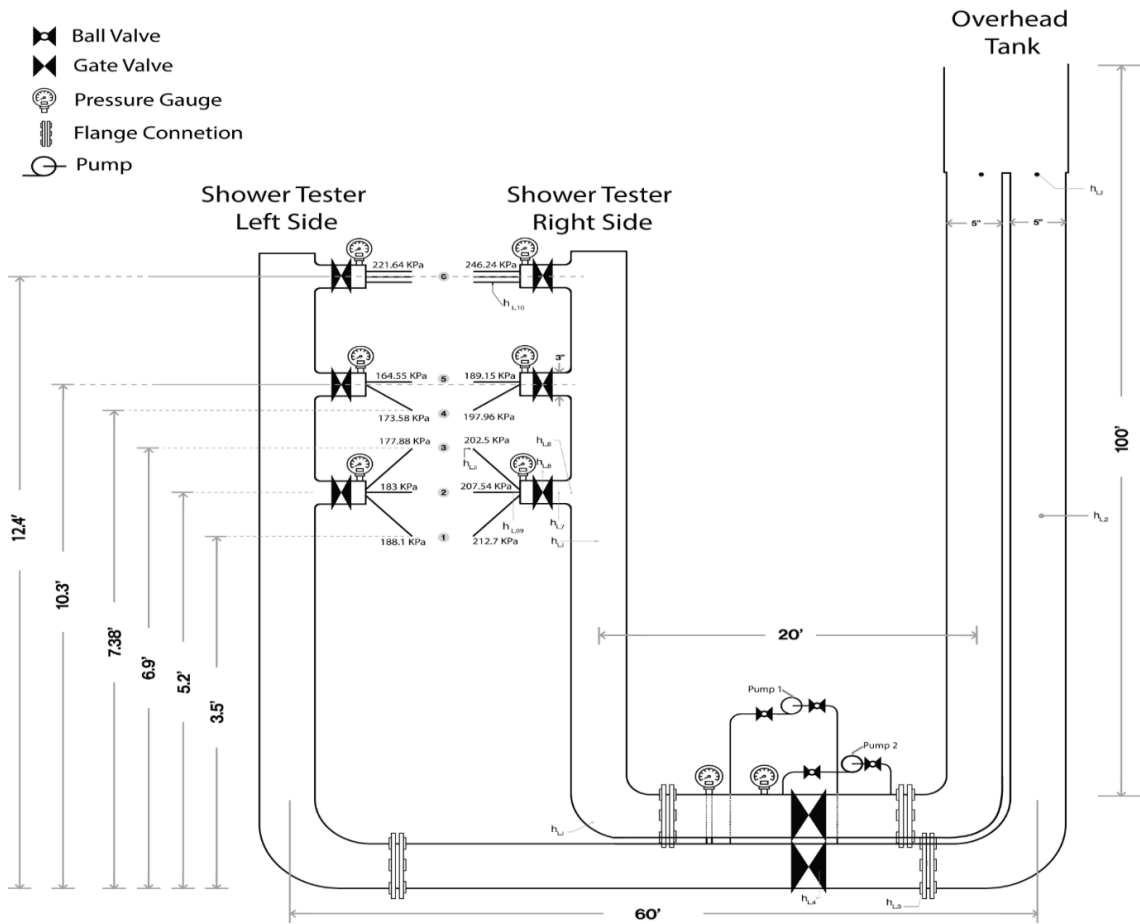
Front view of New shower tester pipe arrangement for Bus with pump
